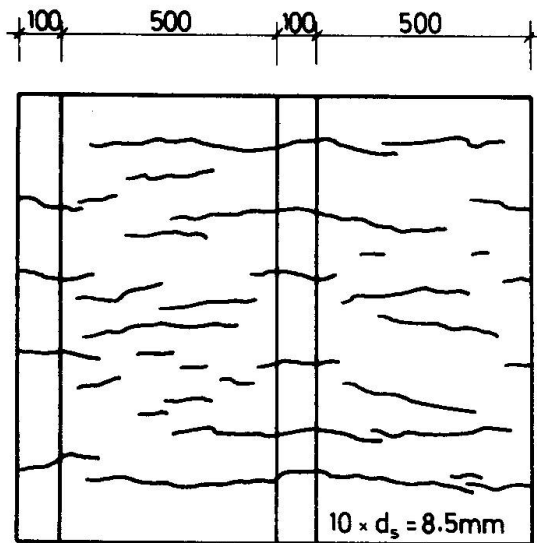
Crack pattern of reinforced concrete panel B 19 ( $Q = 0$ )
